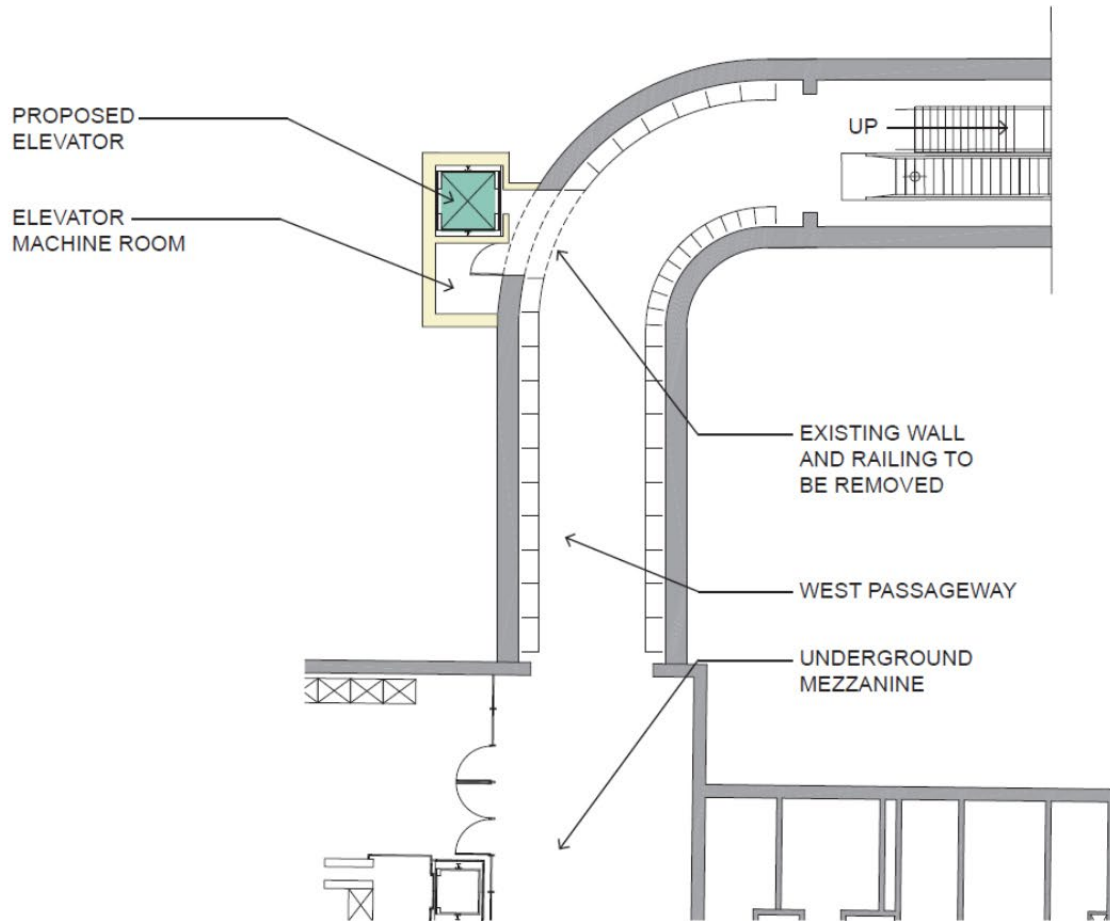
Option 3B Plan Drawing (Mezzanine Level)
